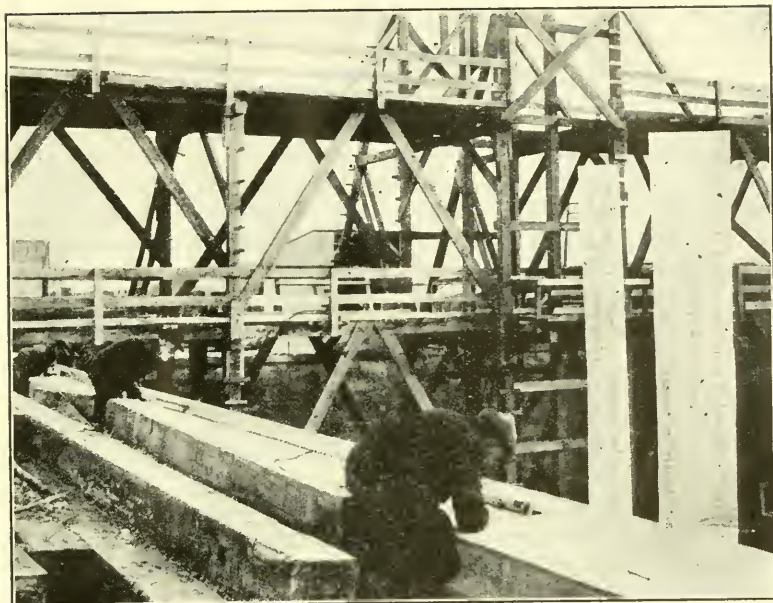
BEAM COMPASS, 37 FEET LONG, SET ON BASE, NORTH WALL, WEEHAWKEN SHAFT. PENNSYLVANIA RAILROAD TUNNELS.
